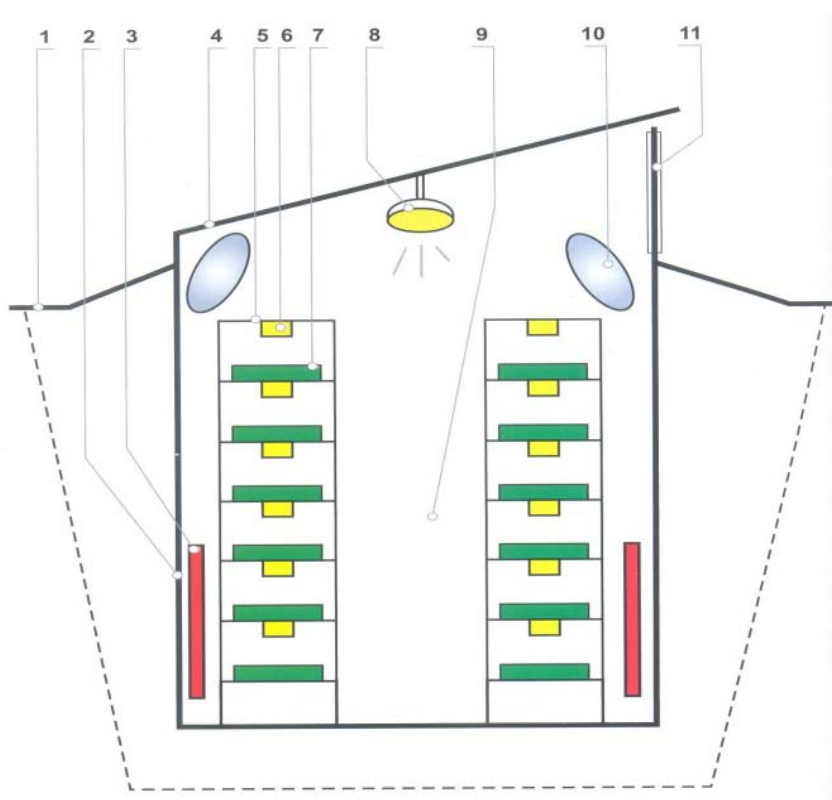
Scheme of arrangement of trench greenhouses (right): 1-soil level; 2-wall; 3-heating system radiators; 4-roof; 5-multi-layered hothouse rack; 6-sources of artificial lighting; 7-trays for cultivation; 8-security lighting lamp; 9-process passage; 10-fans; 11-double-glazed light aperture
